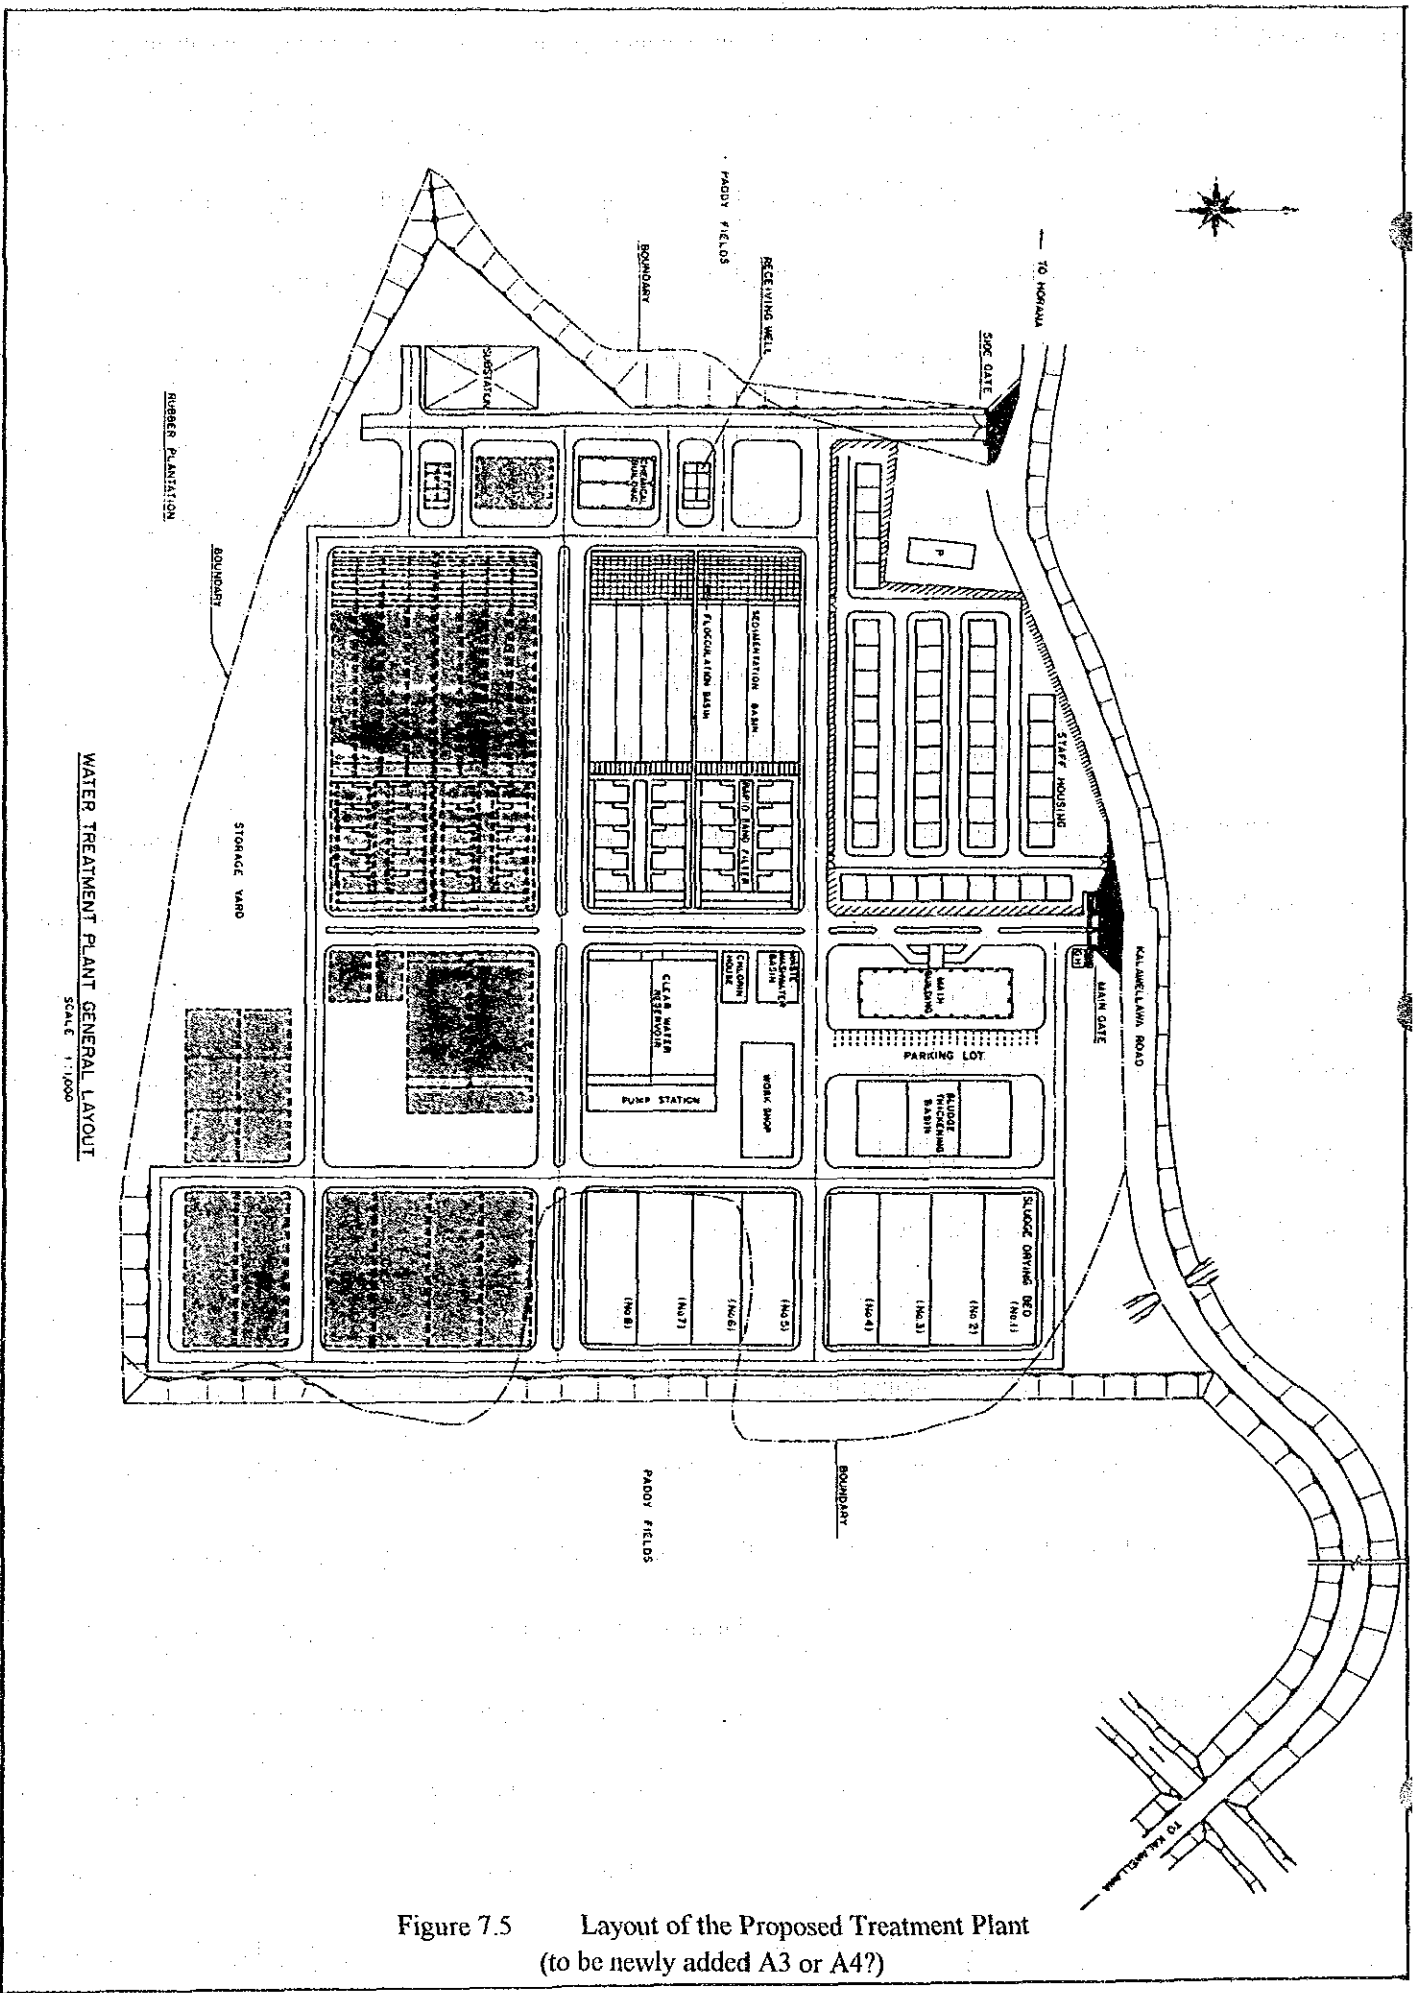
Layout of the Proposed Treatment Plant (to be newly added A3 or A4?)
